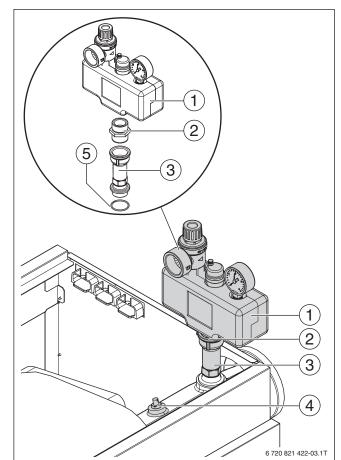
Boiler safety set 3 bar (Depiction: Boiler structure right)
